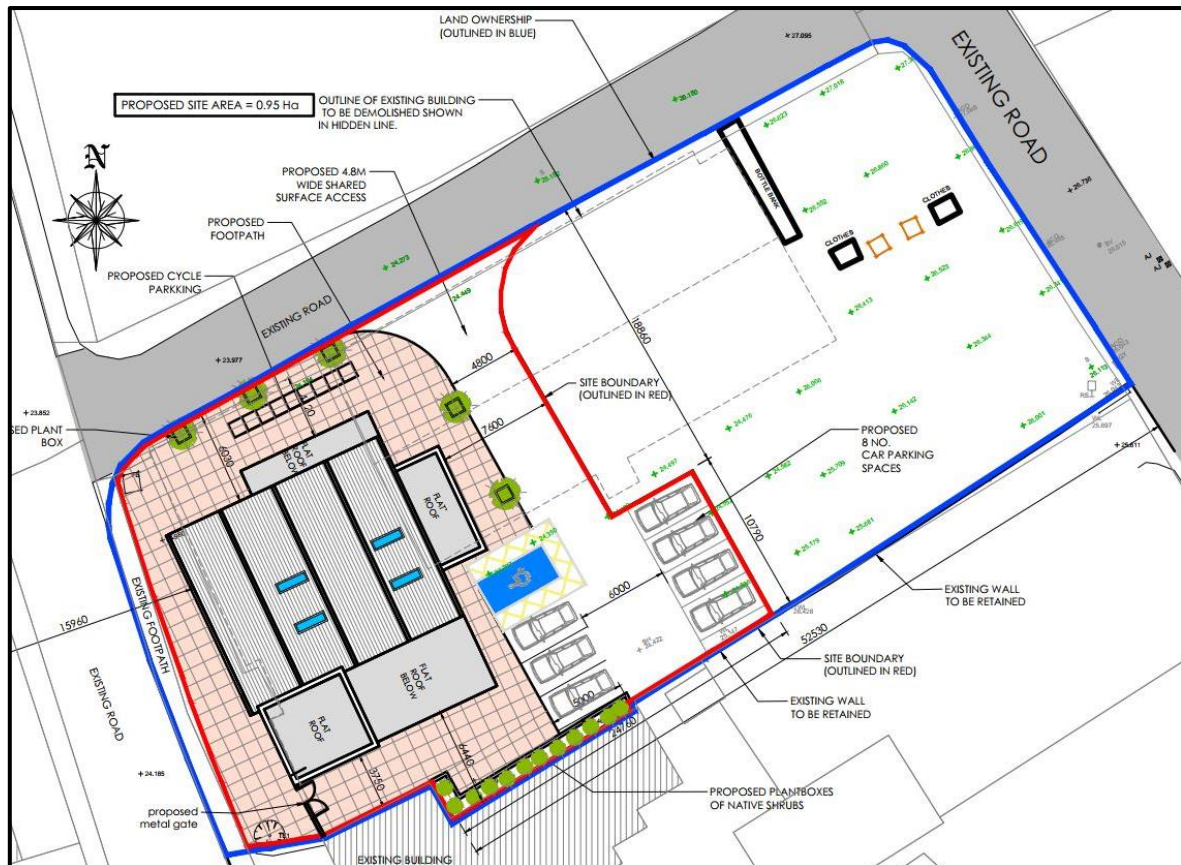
Proposed Site Layout with public library facing Main Street (Sweeney Architects)
